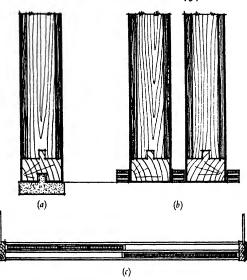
Sliding Doors. (a) and (b) Elevation showing two methods of construction. (c) Plan of sliding doors shown in elevation at (b).
